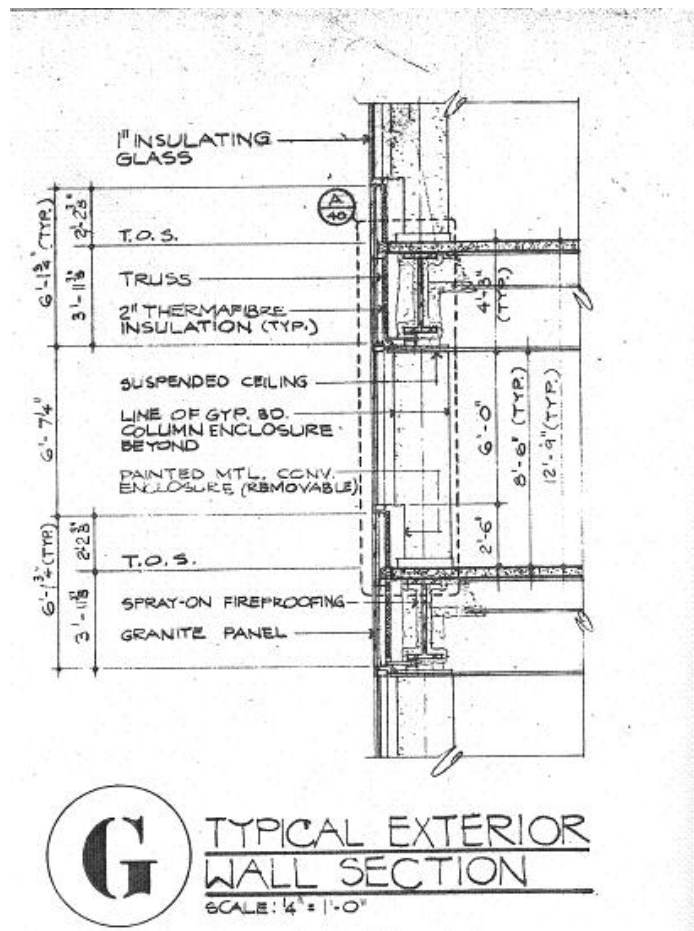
WTC 7 Architectural Drawing 38, Section G: Typical Exterior Wall Section.
